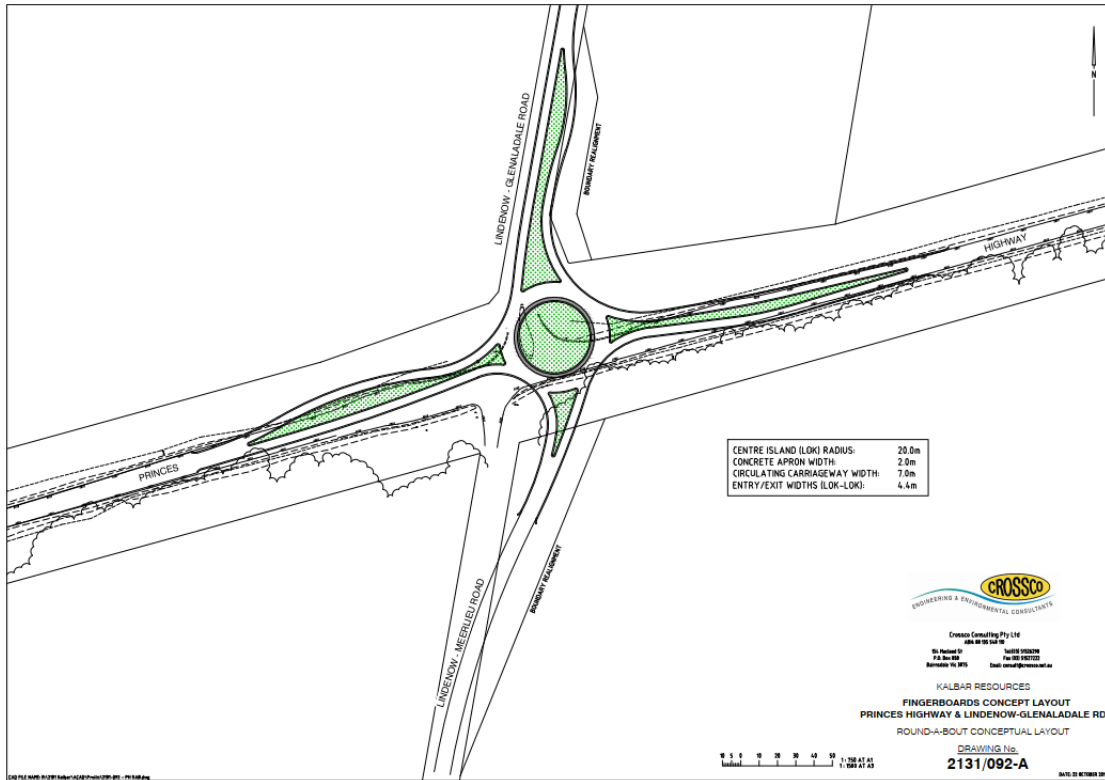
Princes Highway / Lindenow-Glenaladale Road roundabout concept plan
